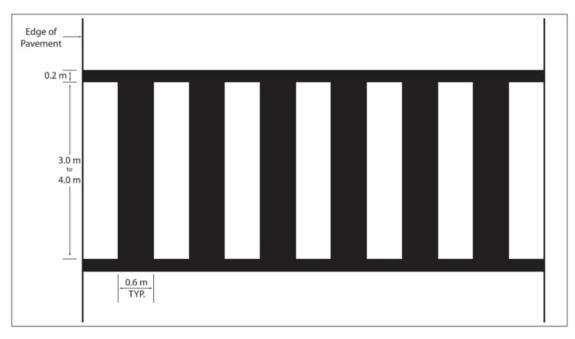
Typical Ladder Crosswalk Markings (Source: OTM Book 15)
